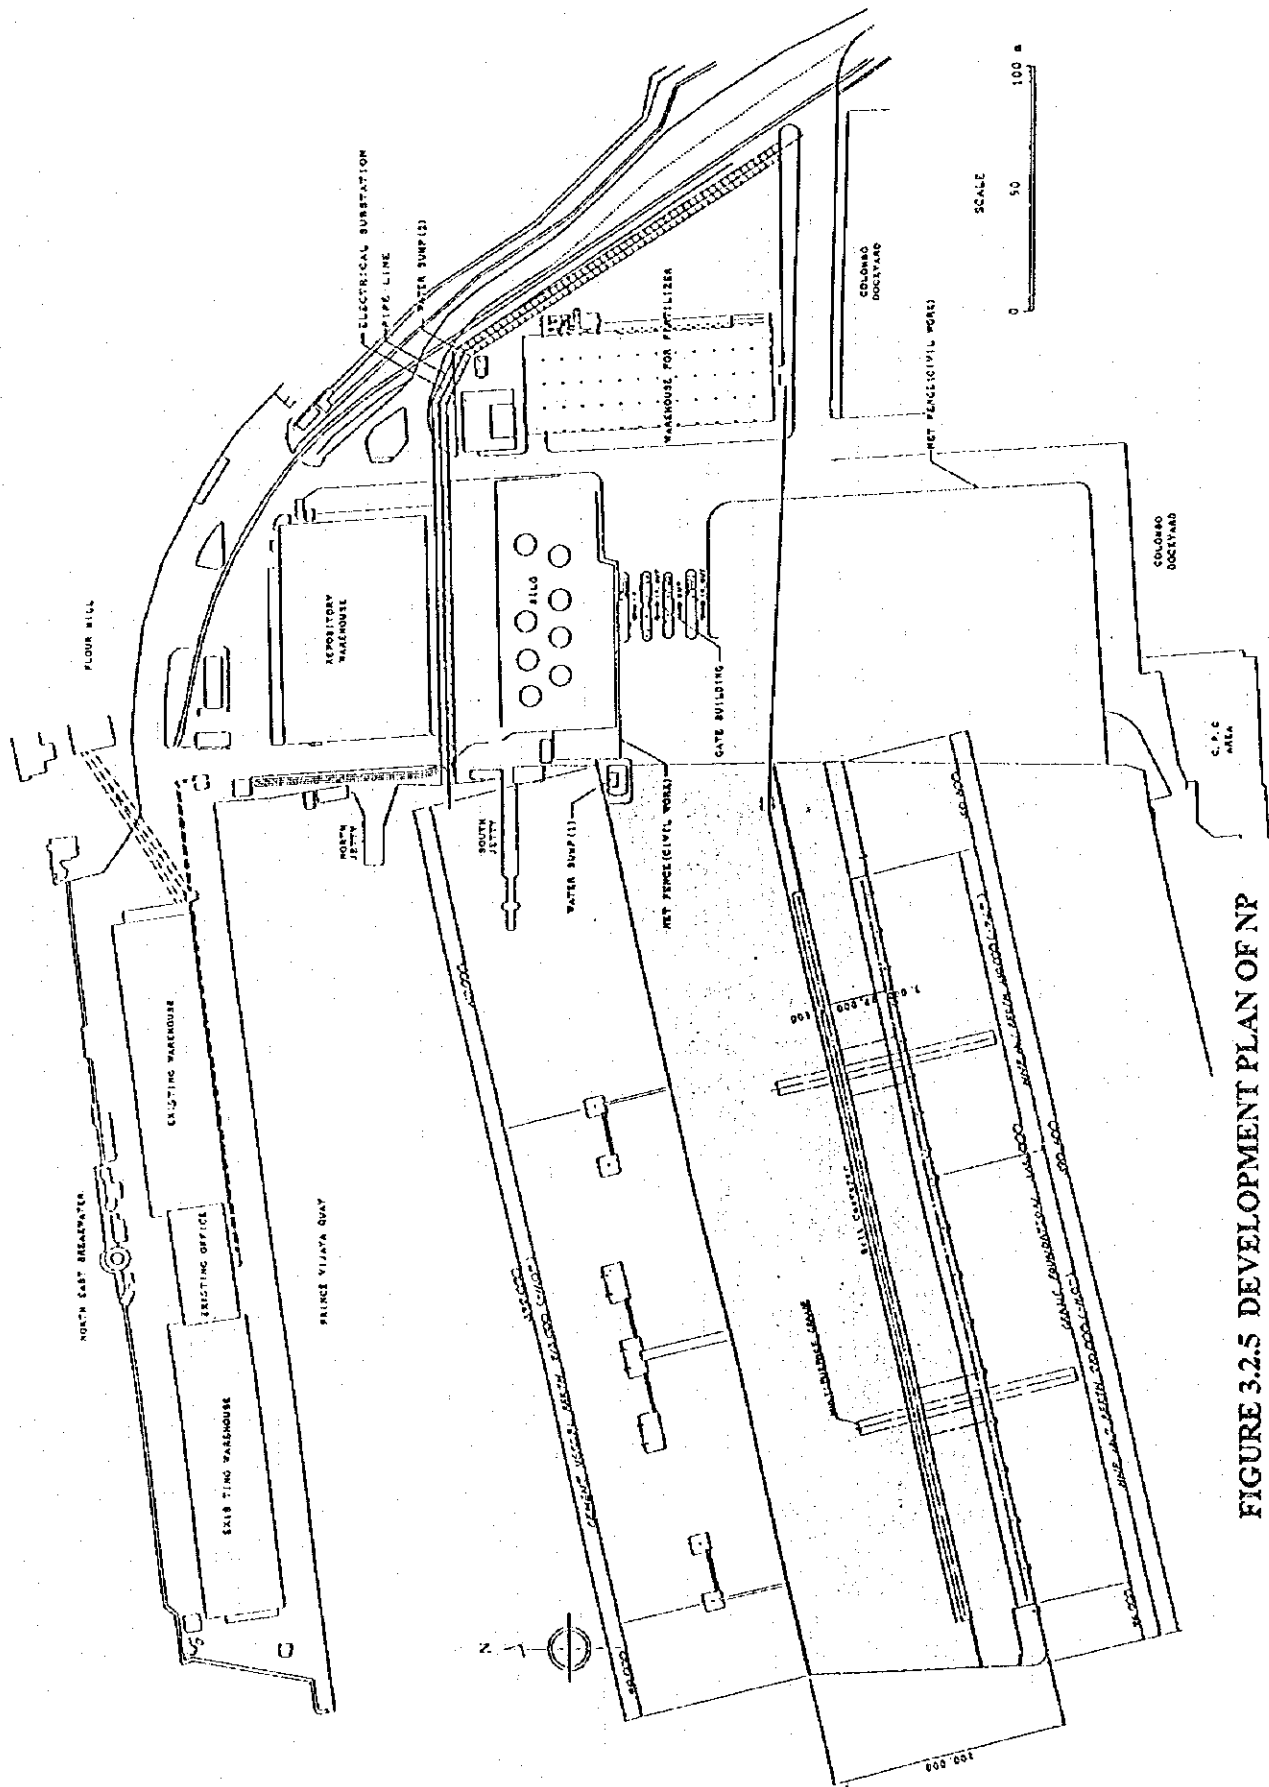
DEVELOPMENT PLAN OF NR
